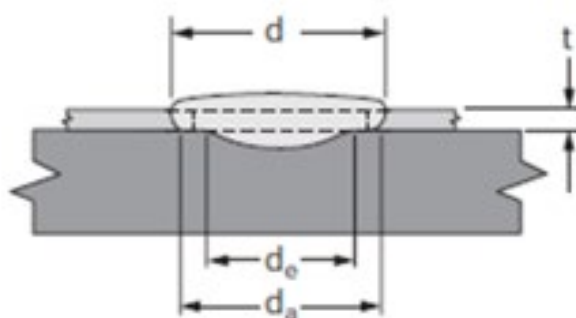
Puddle Weld Dimensions (from AISC Design Guide 21)
